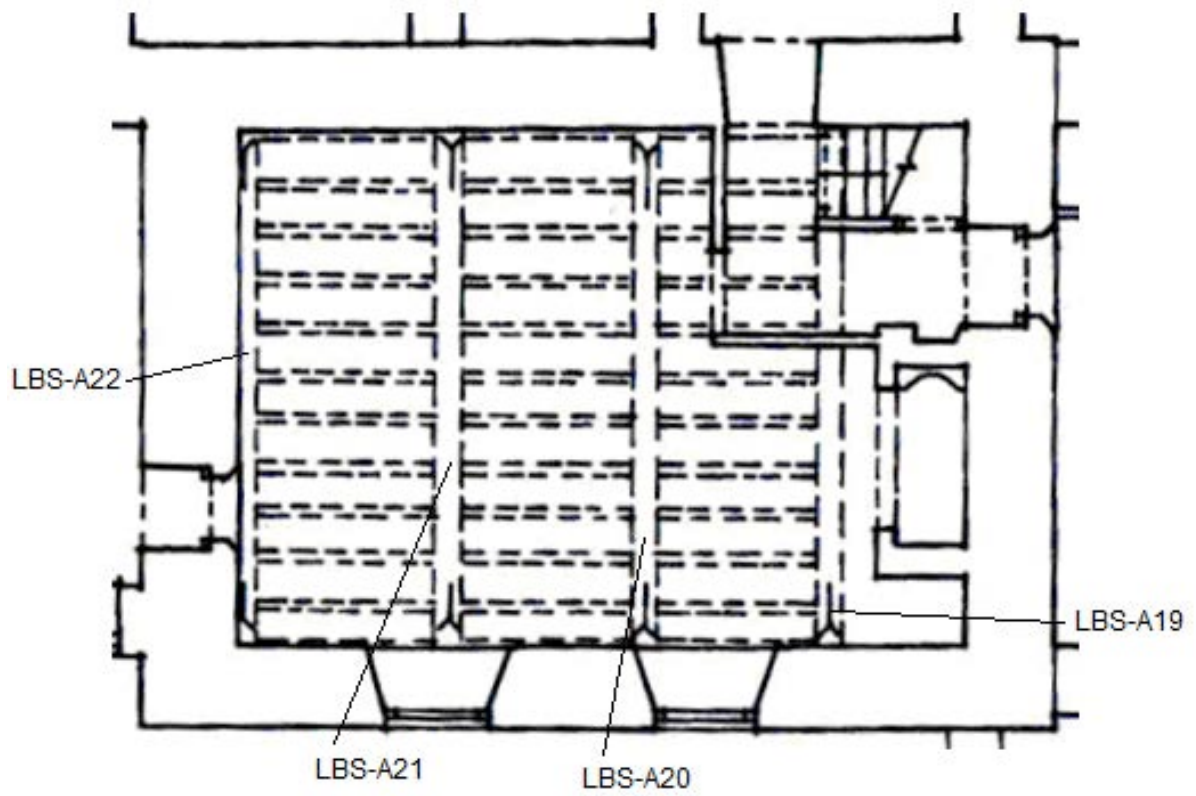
Central hall/parlour range; showing the location of samples LBS-A19-22 (Martin Roberts)
